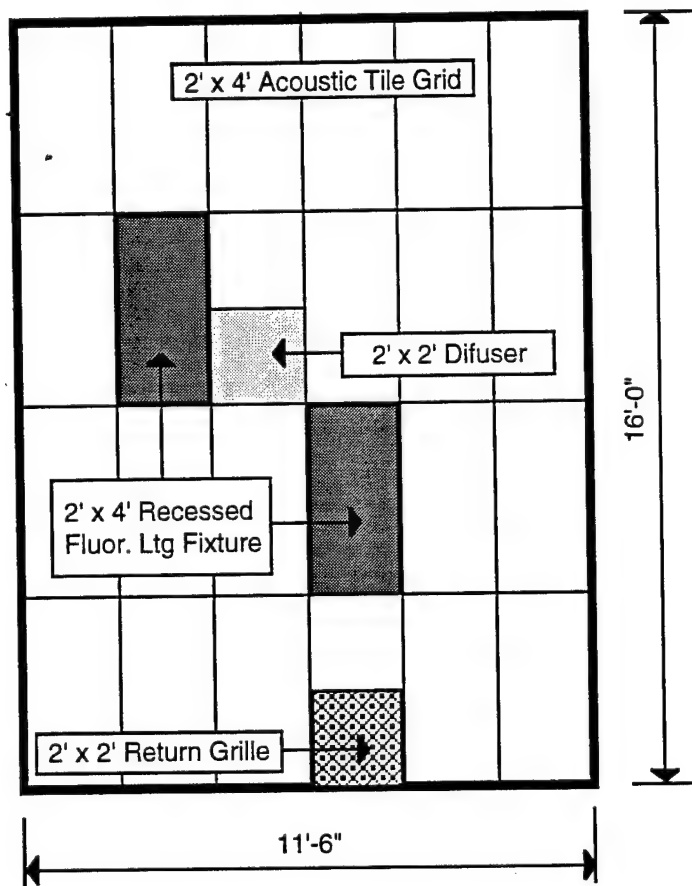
TEST CHAMBER REFLECTED CEILING PLAN.
